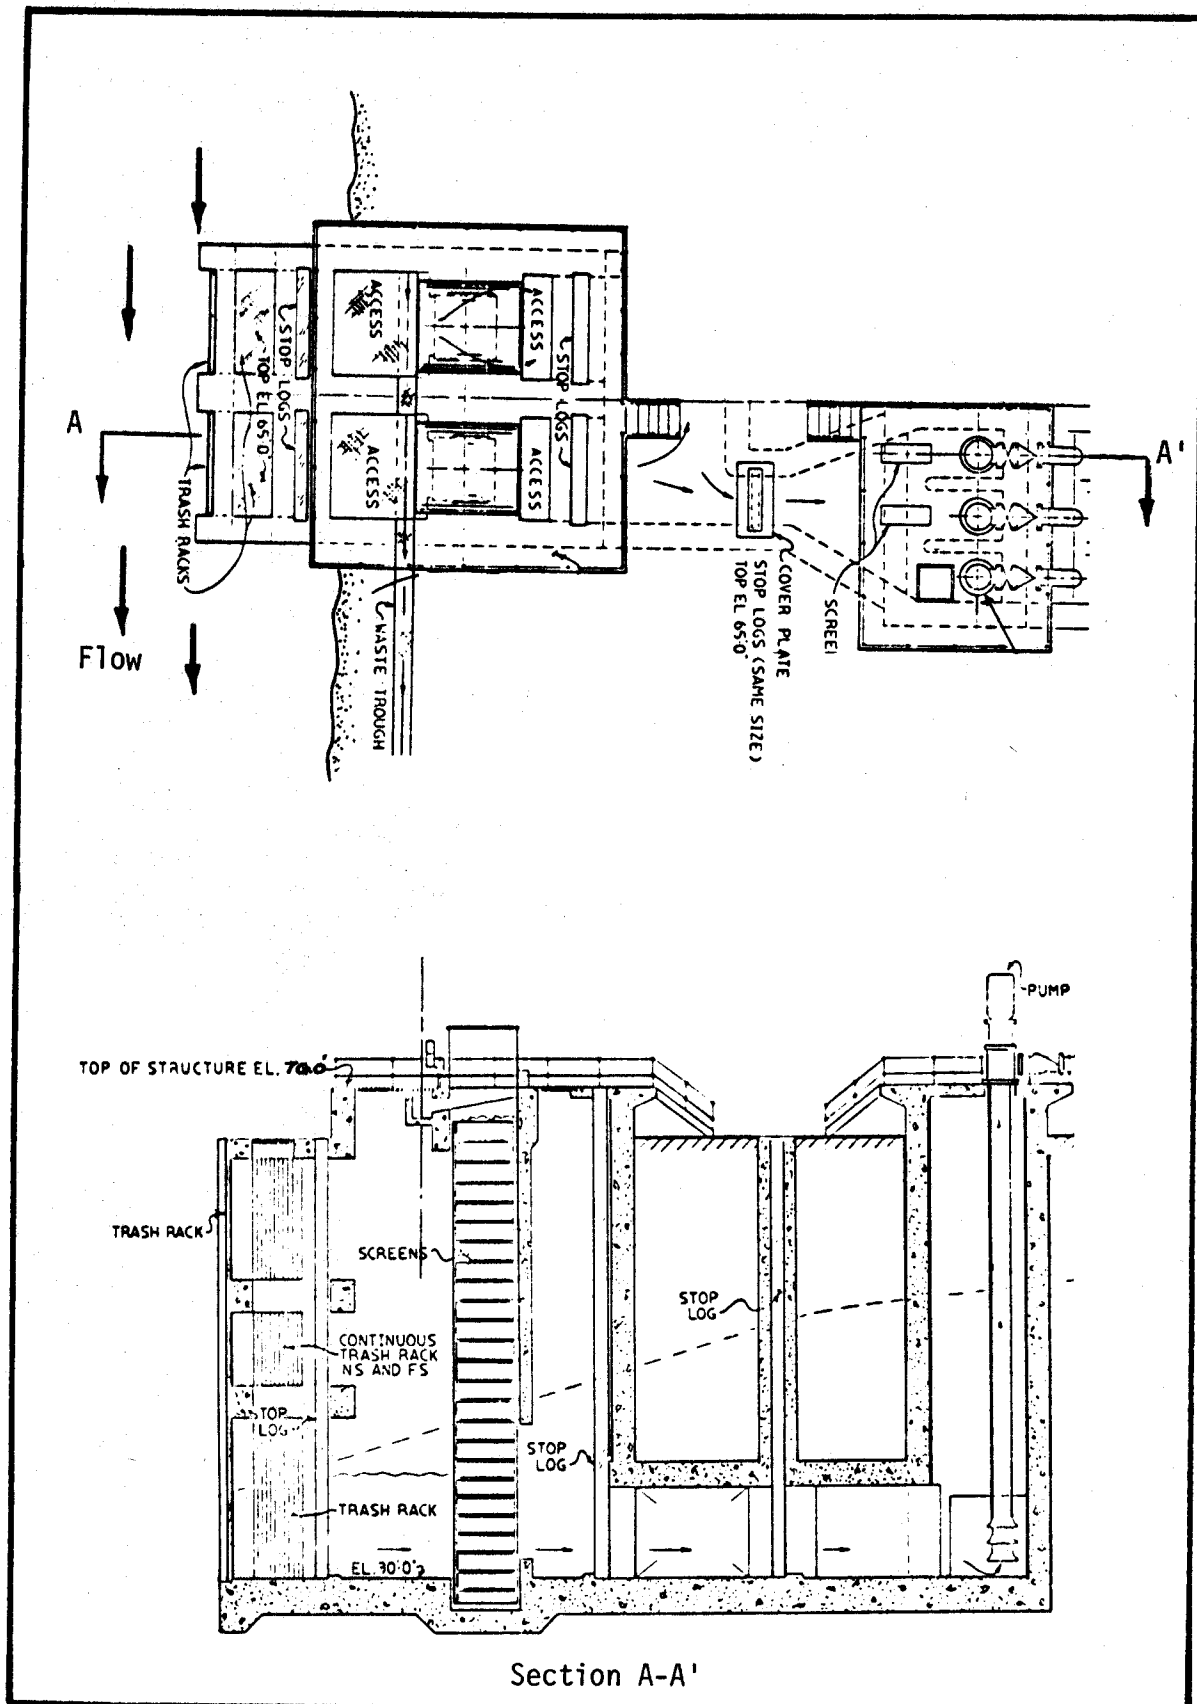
ILLUSTRATION OF AN ALTERNATIVE WATER INTAKE CONFIGURATION -- CONVENTIONAL TRAVELING SCREEN INTAKE
